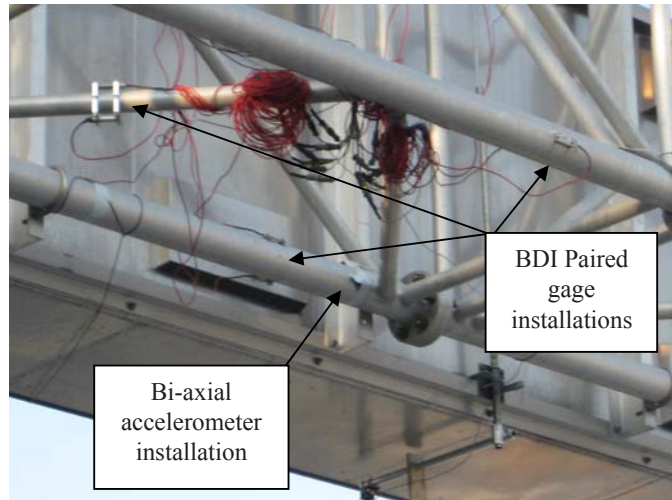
Accelerometer and BDI gage installations near mid span on lower truss chords and connecting struts
